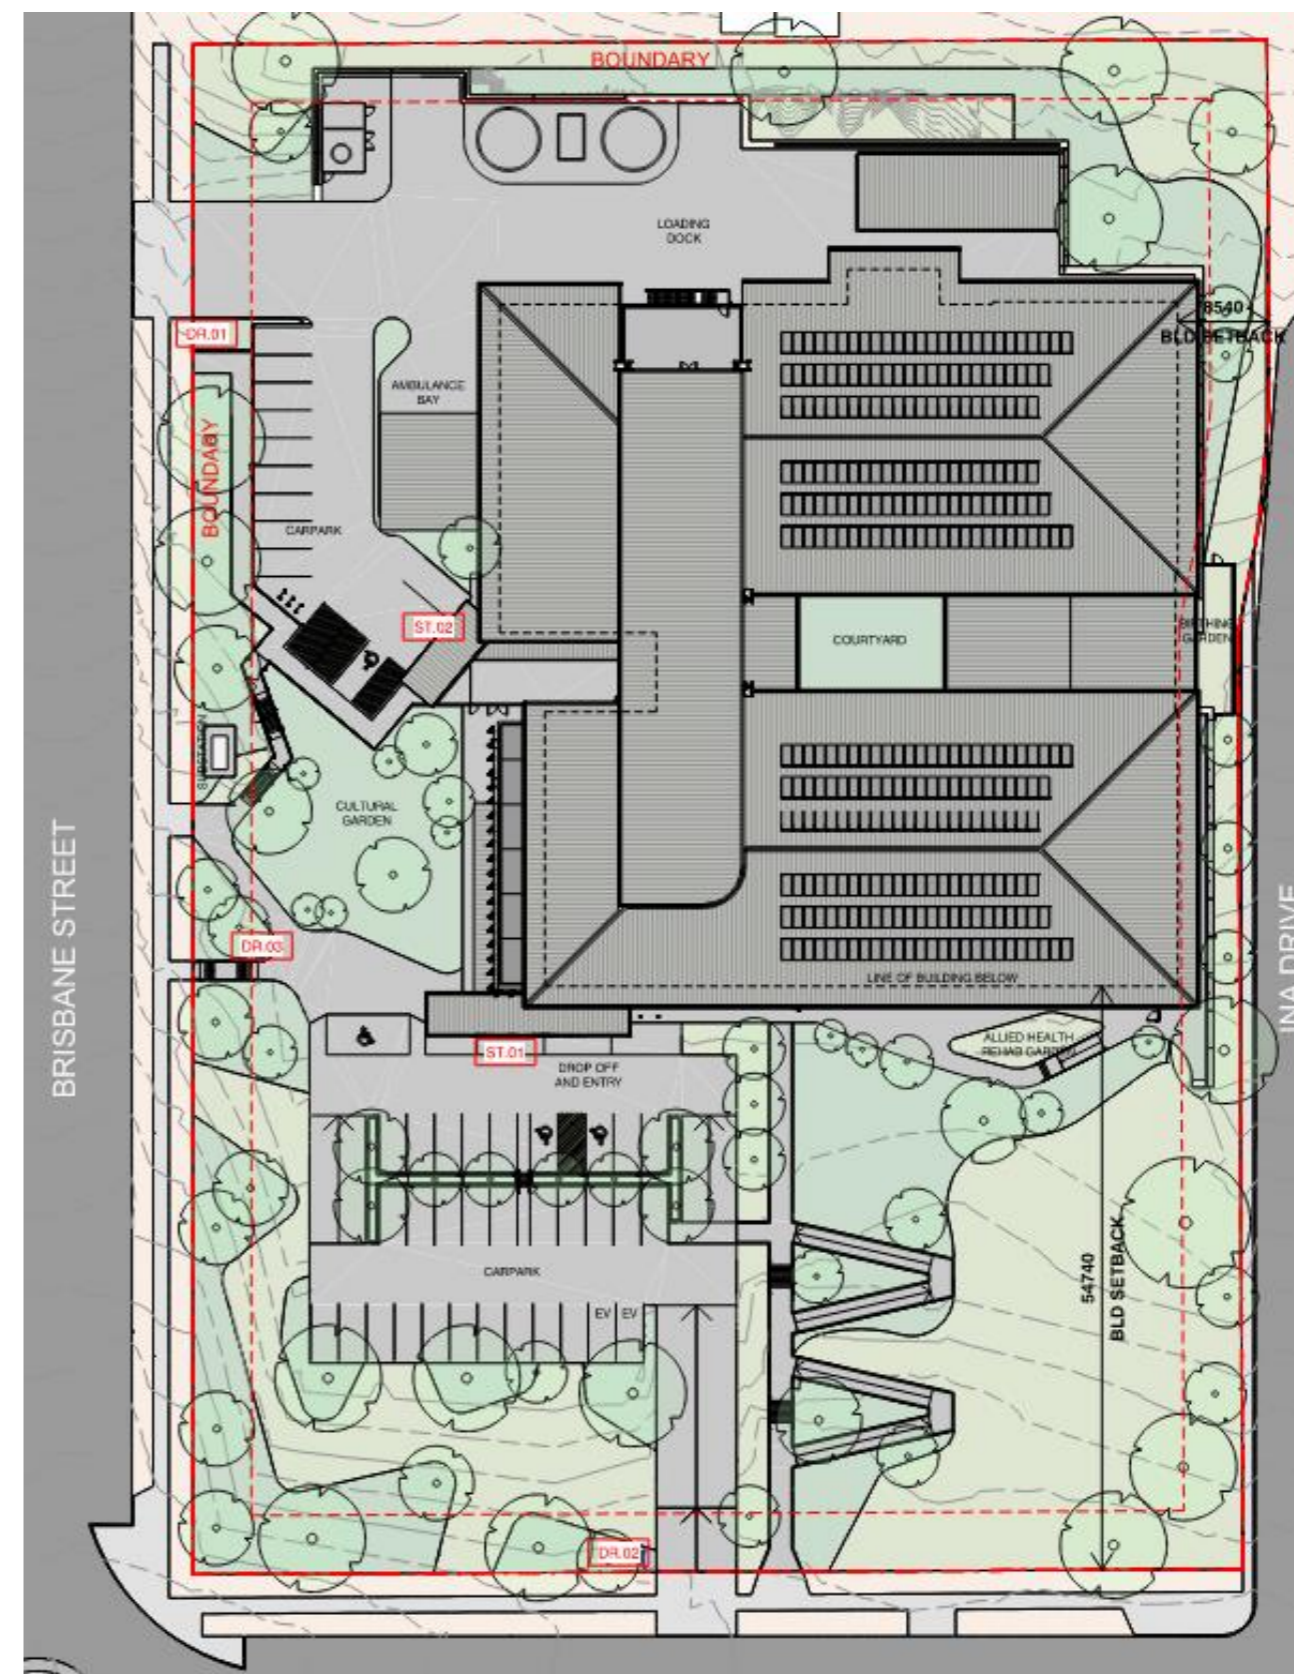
Proposed Site Plan Prepared by DJRD Architects.
